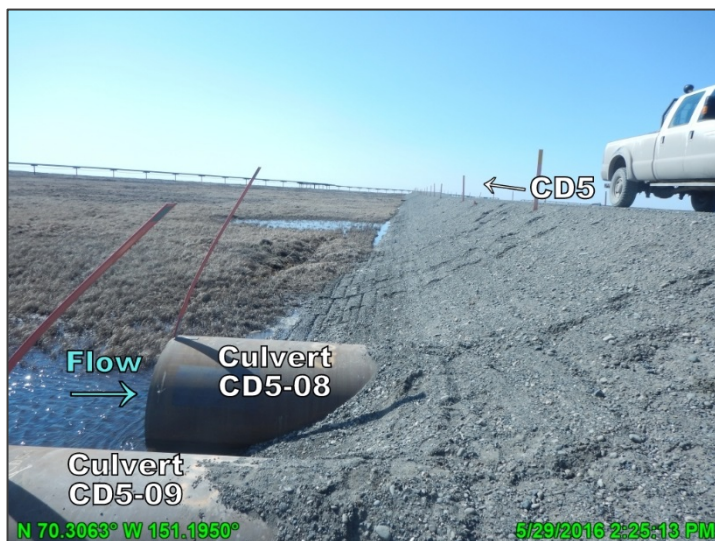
South side of CD5 road south of Lake MB0301, looking southwest; May 29, 2016
